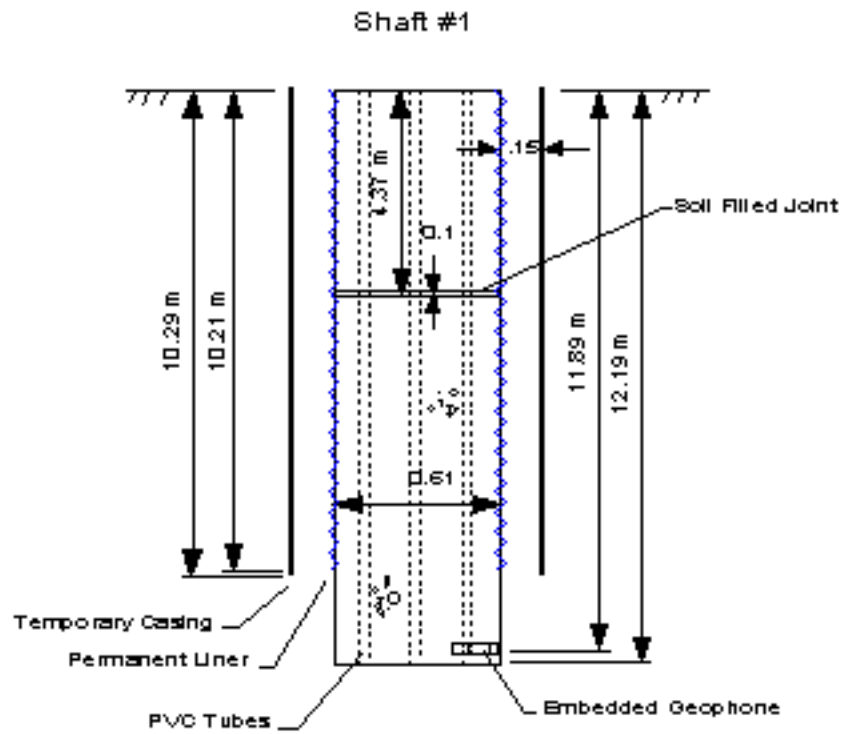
Detailed Schematic of Shaft 1 - Accessible-Head Condition
